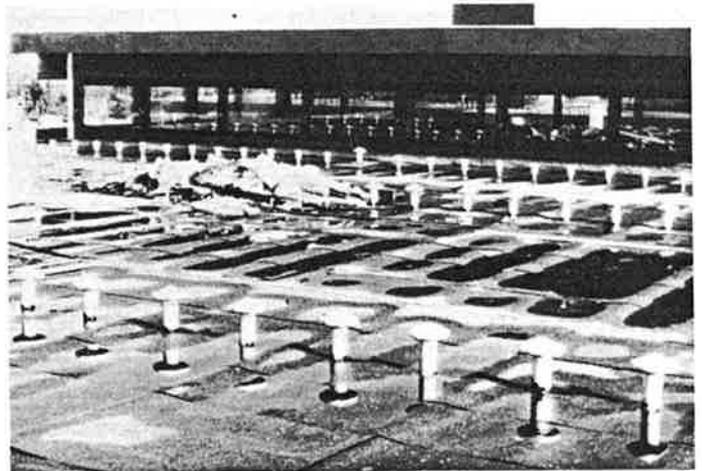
The many and varied vents which had been placed on the swimming pool roof to try to improve ventilation
